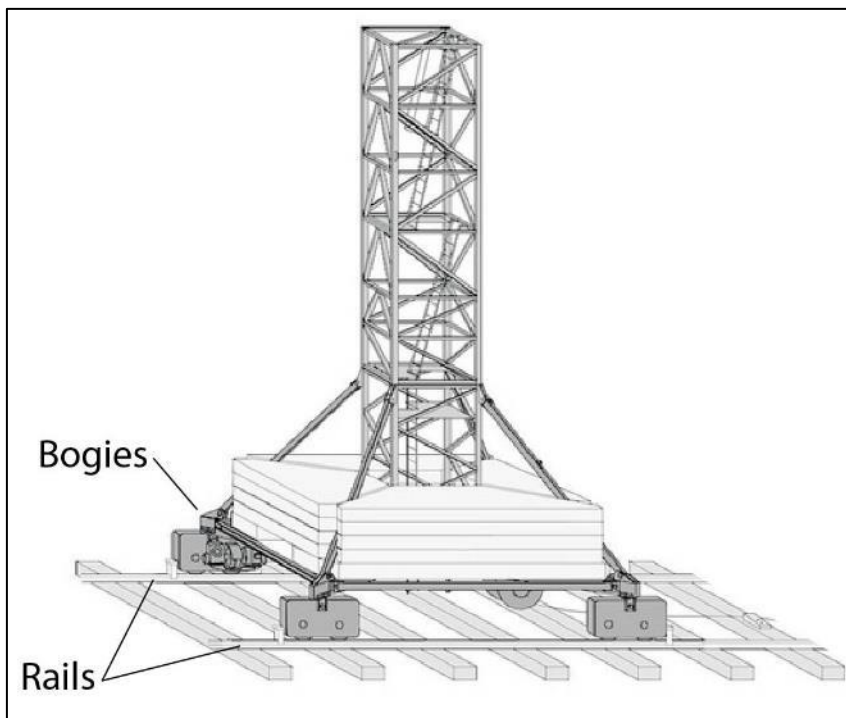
Rail-mounted undercarriage (adapted from <https://goo.gl/eY2J0N>)
